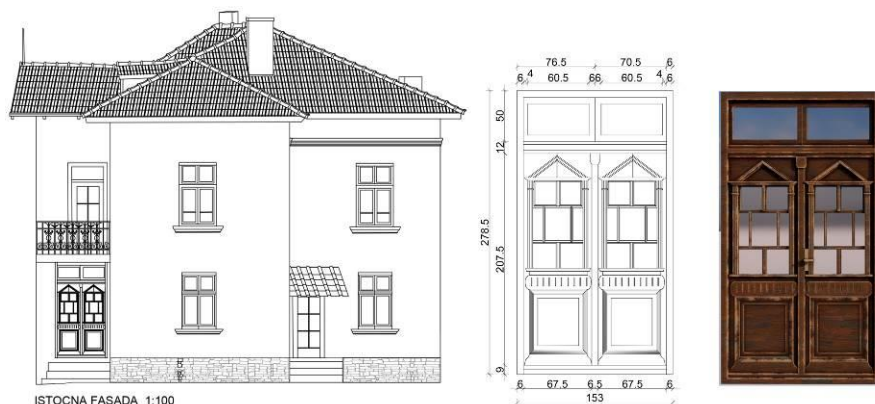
East façade and door detail, Marta Rakonjac and Marijana Ćendić, after [2]
